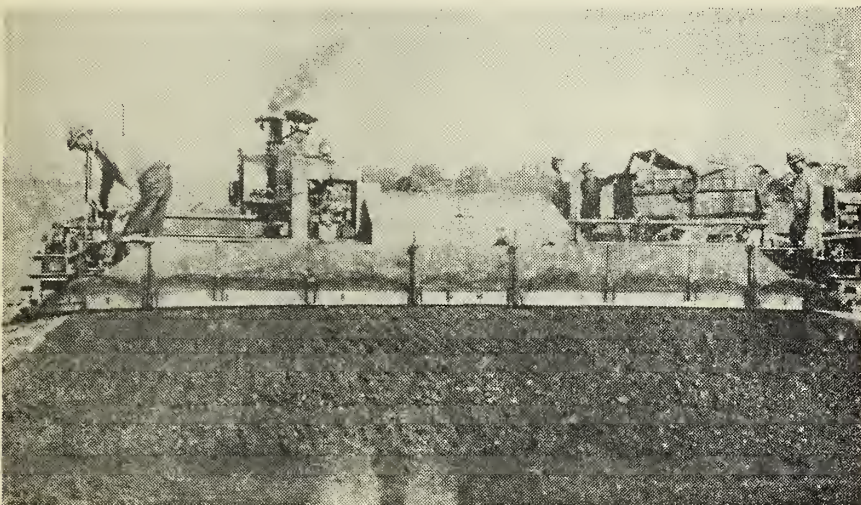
A view of the front of the machine' showing the extension plate on the front screed
